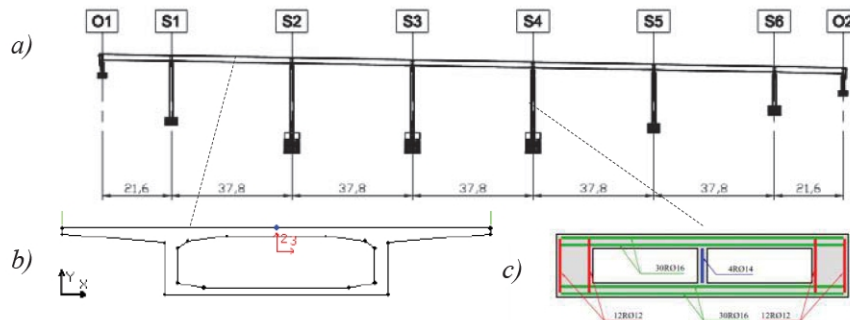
a) Bridge layout; b) Idealized bridge deck cross section; c) pier cross section with adopted reinforcement
